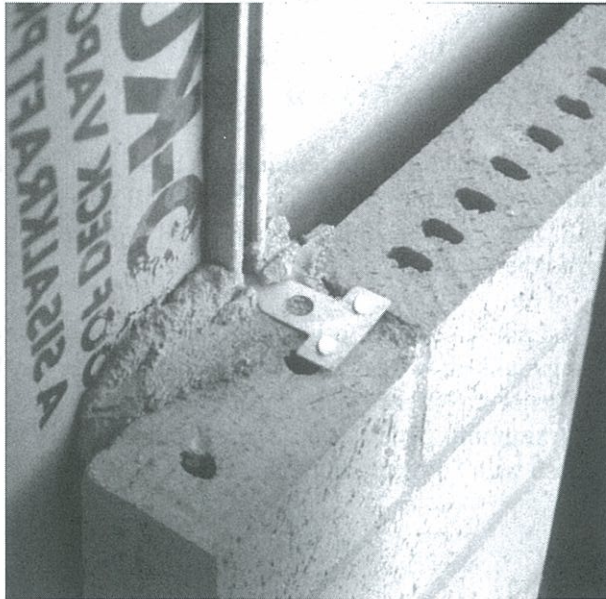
Sheathing, studs, using hat channel and Fleming anchors which engage wire reinforcement. See details pages 52, 54 and 56.
